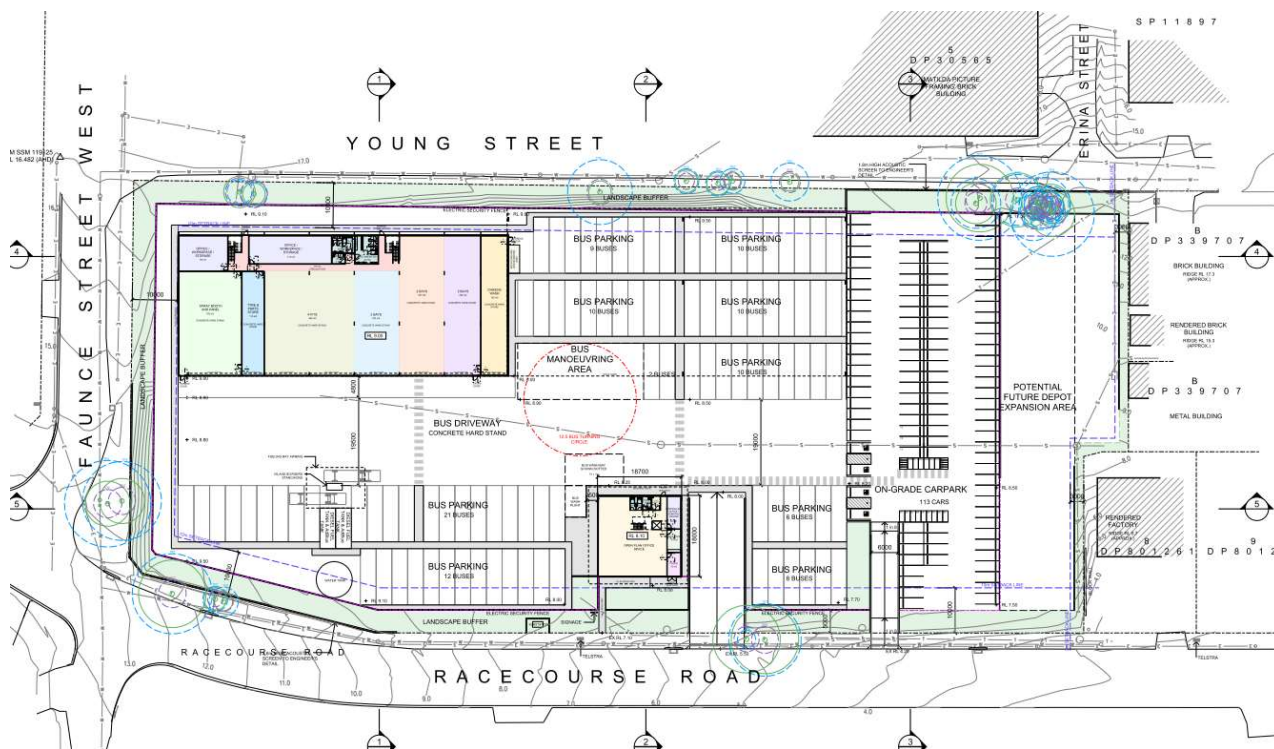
Proposed Site Plan (Courtesy of DEM)
